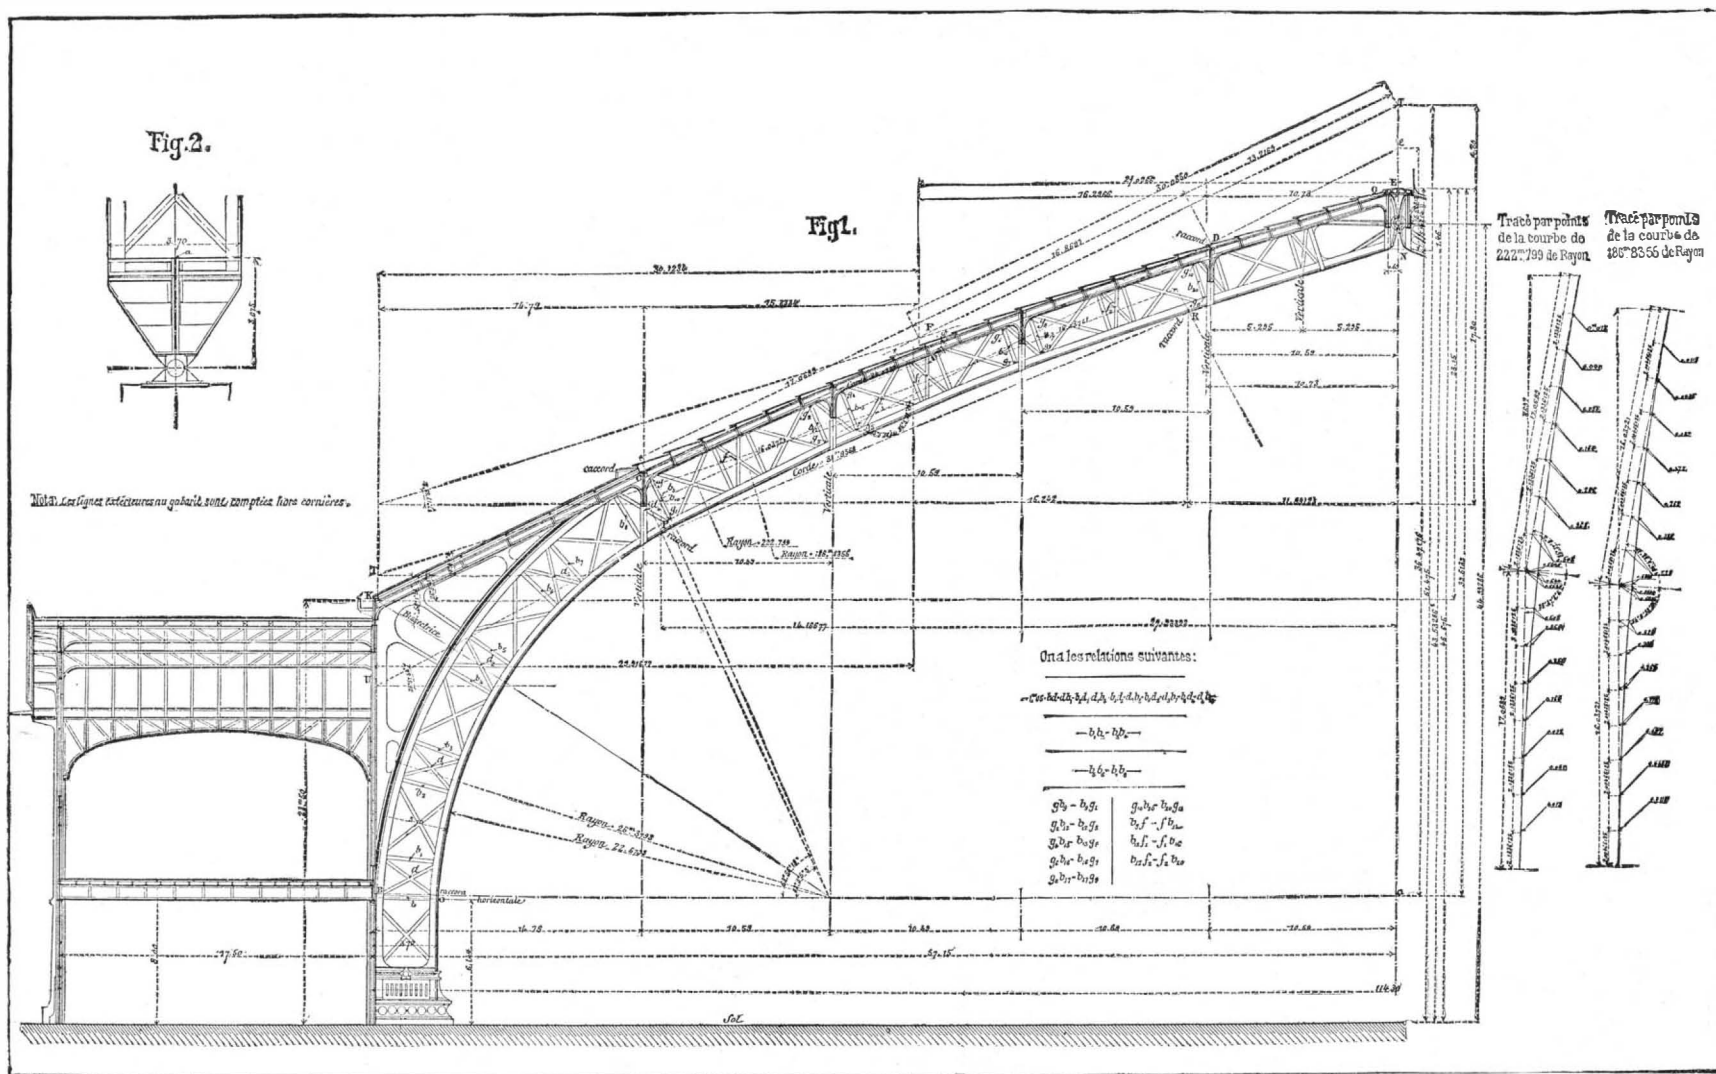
General Elevation of one of the Trusses (Scale, 1-200).
